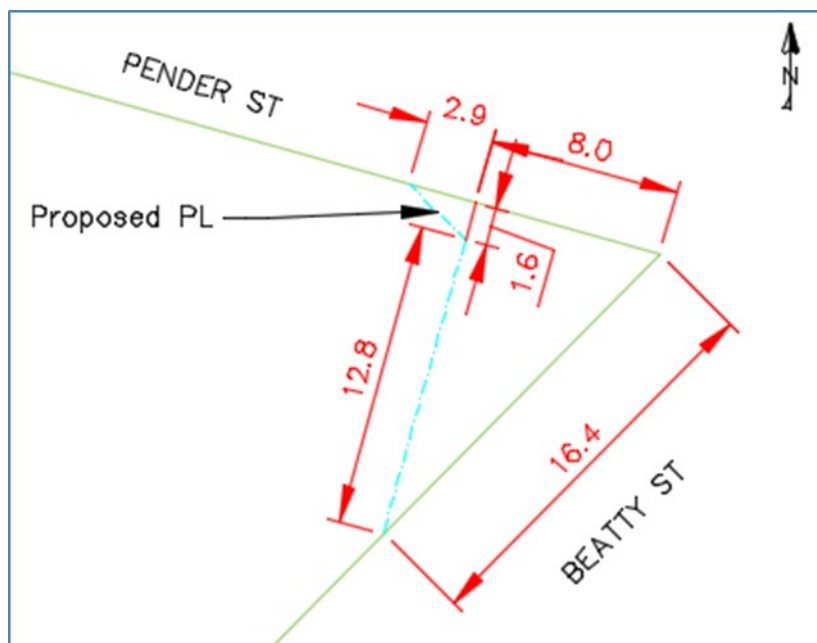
Dedication requirements at the corner of W Pender Street and Beatty Street
